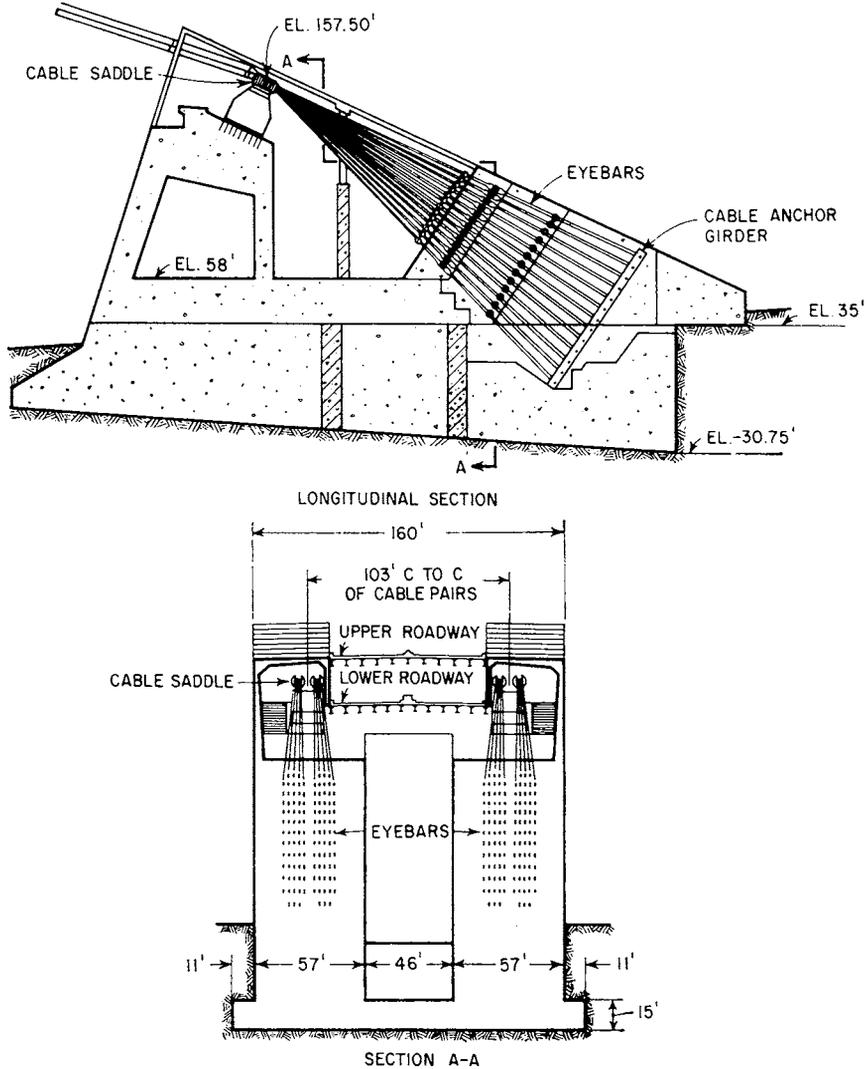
Anchorage for Verrazano Narrows Bridge.
